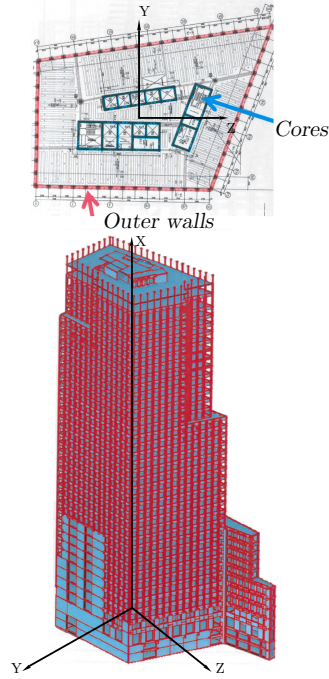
Layout of the stability cores and walls of the JuBi tower
